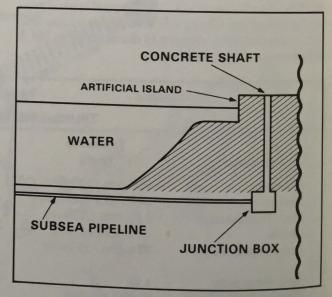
During construction of an artificial island, a junction box, horizontal pipe casing and vertical connection shaft would be installed. The subsea pipeline would be pulled through the casing for connection in the junction box.
